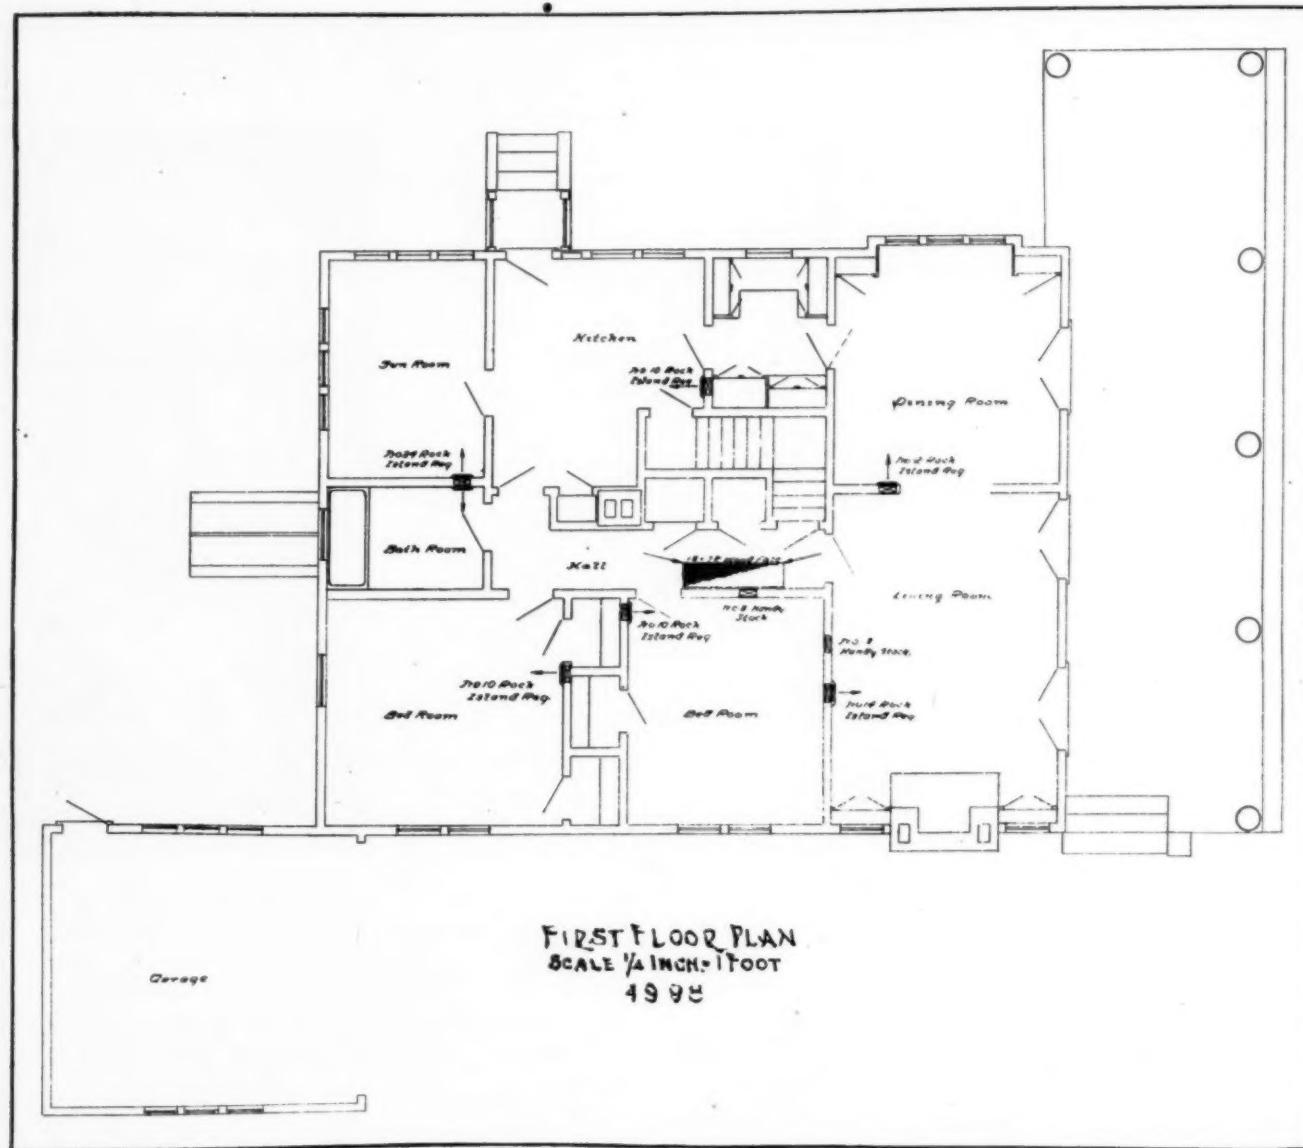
First Floor Plan for Warm Air Heater Installation in Home of Dirk Meyer, Pekin, Illinois, Showing Location and Size of Registers.
